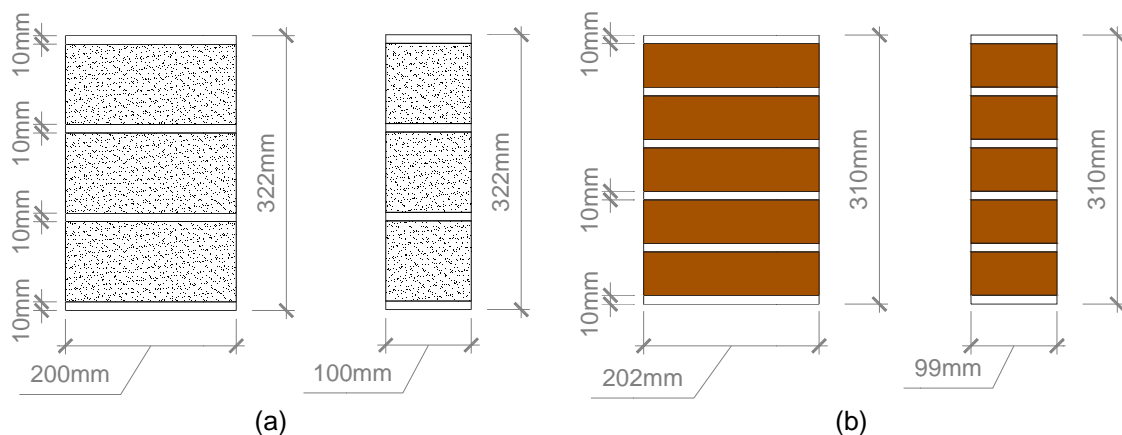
Geometry of specimens: (a) concrete hollow prisms (front and lateral view); and (b) brick prisms (front and lateral view)
